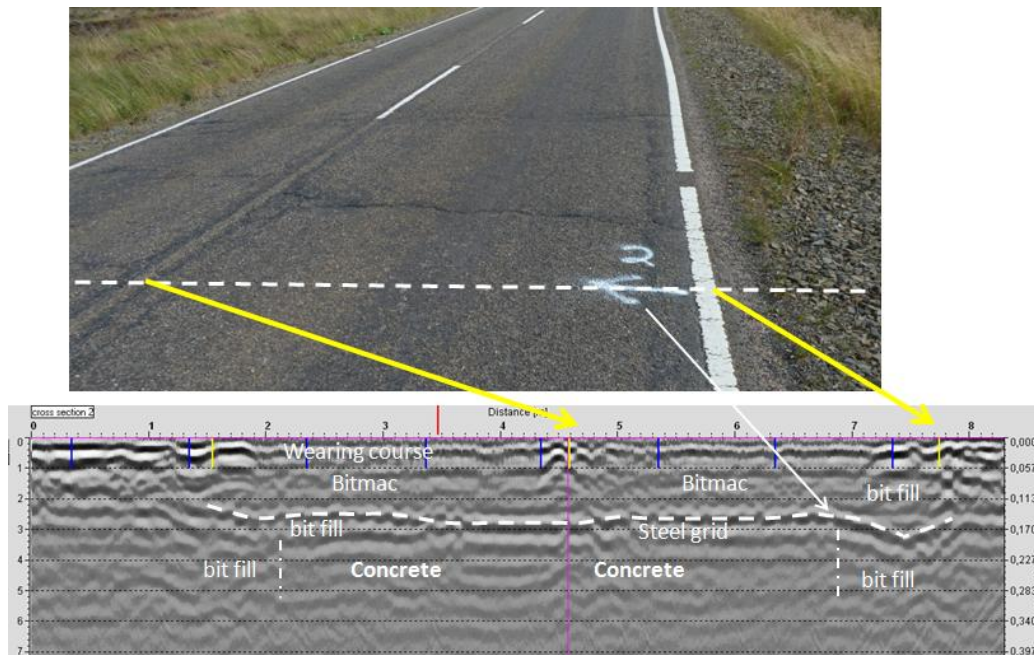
11. 1.5 GHz GPR cross section from Killimster Moss road with closely spaced transverse cracks (see photograph) and longitudinal cracks in road centre (left yellow arrow) and road shoulder (white arrow). In this case the steel grid was installed directly on top of the concrete slab and only a thin bituminous leveling mix could be found under the left side. The longitudinal shoulder crack reflects the location of the end of the concrete slab.
